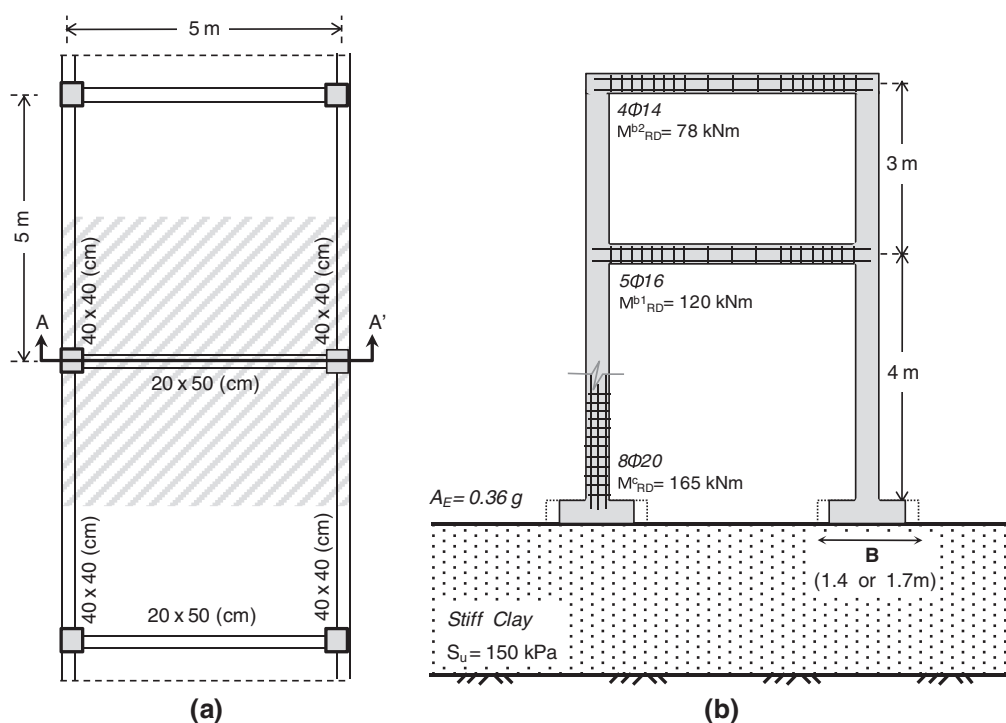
Geometry and member properties of the typical frame structure analyzed: (a) plan view, and (b) cross section A-A'.
